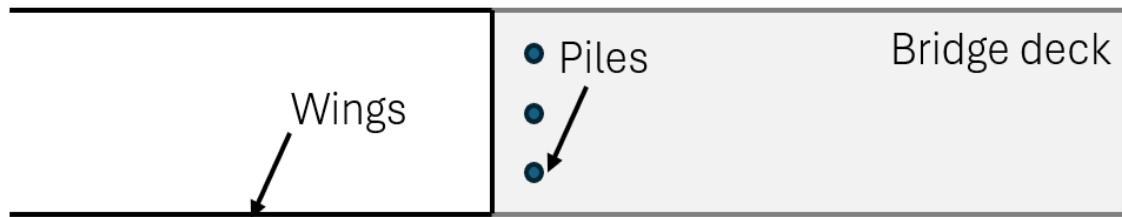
Conceptual sketch of a plan view of an integral abutment bridge with three piles.
